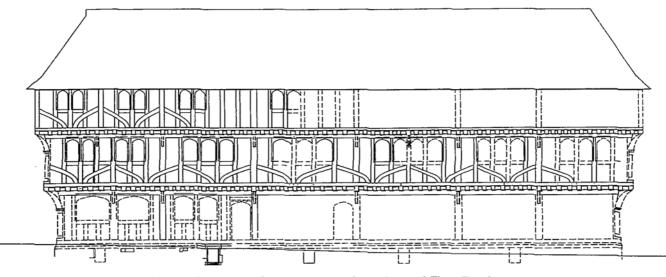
44 Burgate, Canterbury: Elevations of ground Floor Framing.
